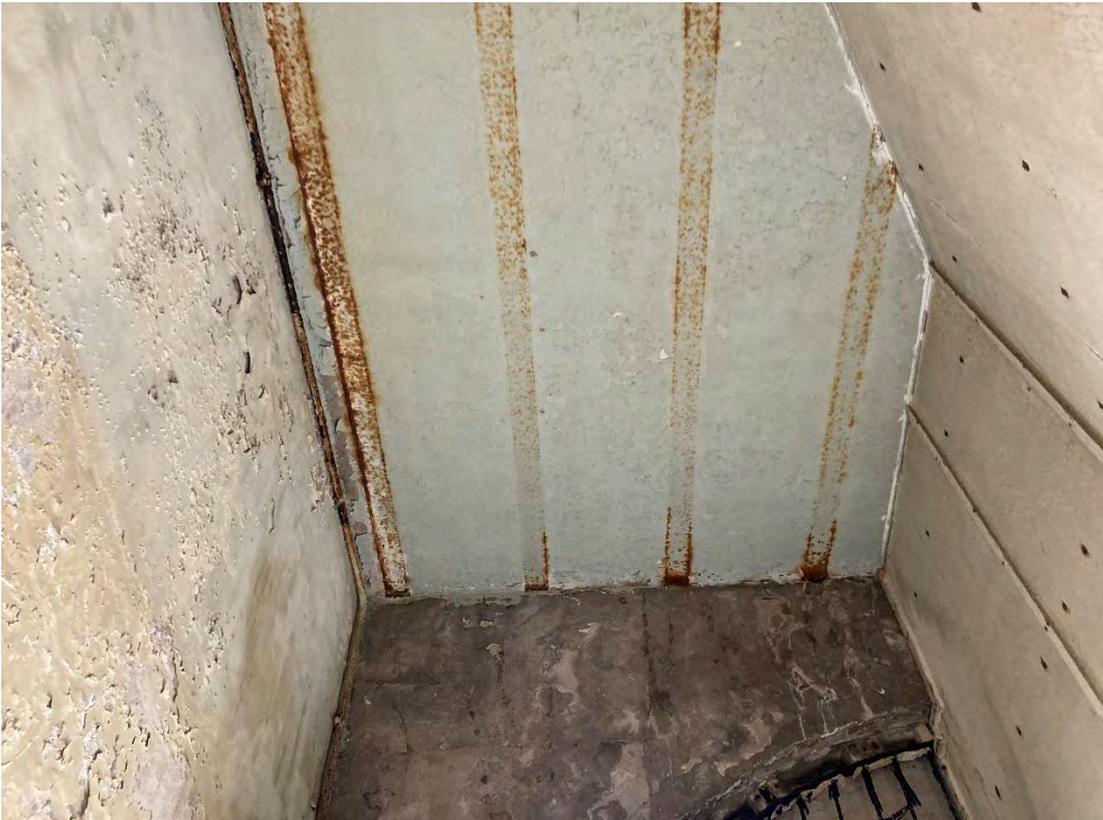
Condition inside Arches No. 146 – 147. Widespread cracking.
